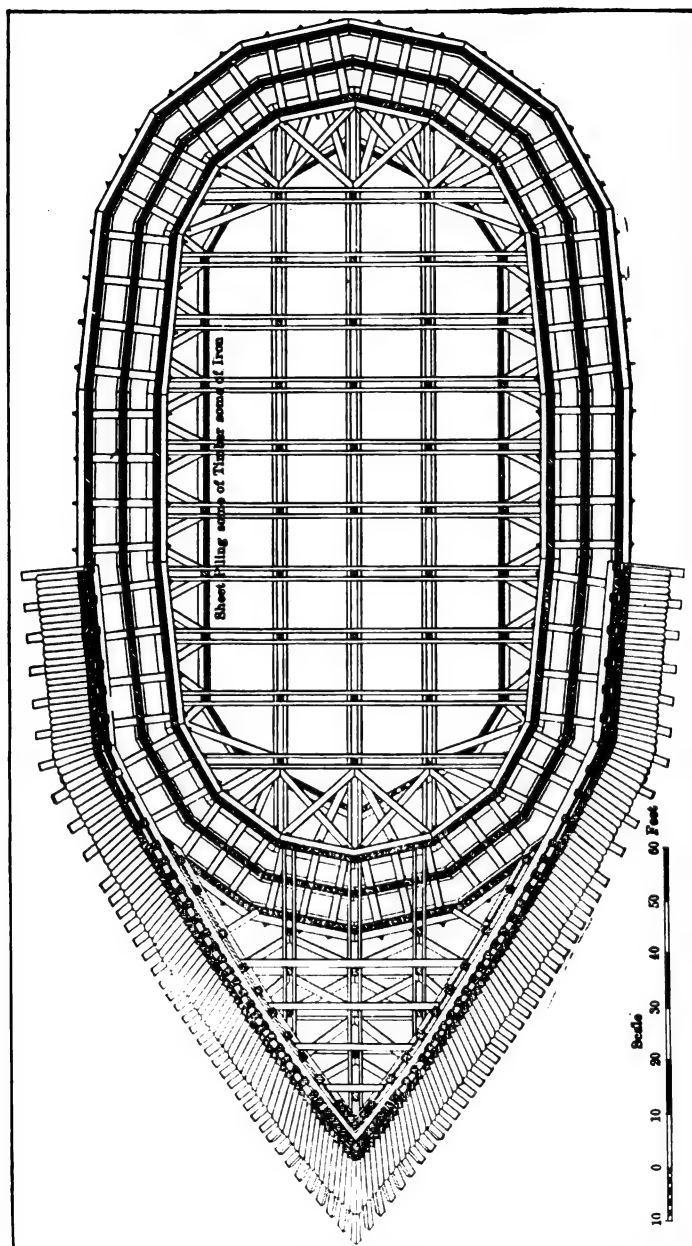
BUDA PESTH SUSPENSION BRIDGE, PLAN OF COFFER-DAM No. 3.
